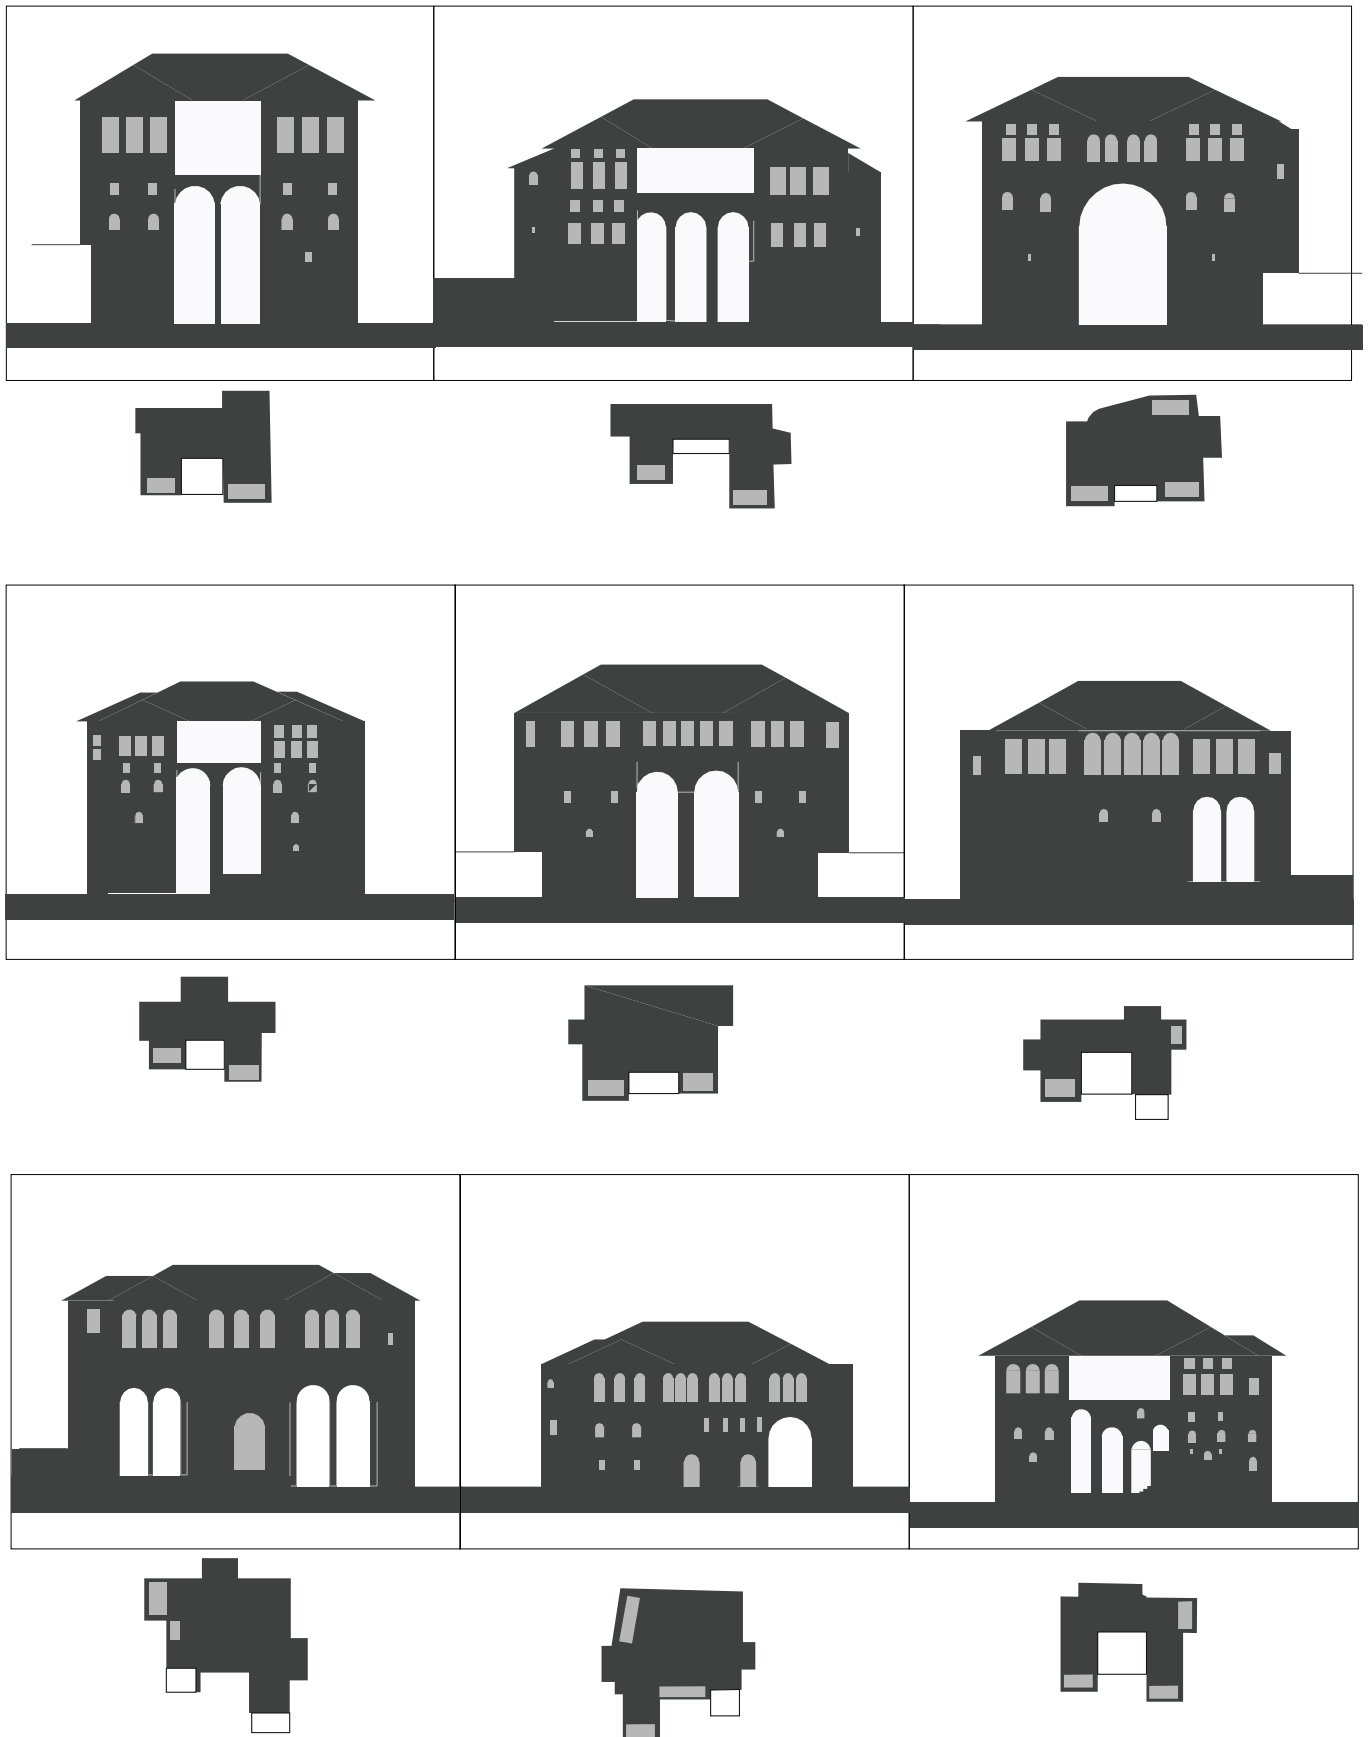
Voids in Gjirokastra building's facade. Visual interrelation or structural relation between the main voids in Gjirokastra house facade. (source: author's)
